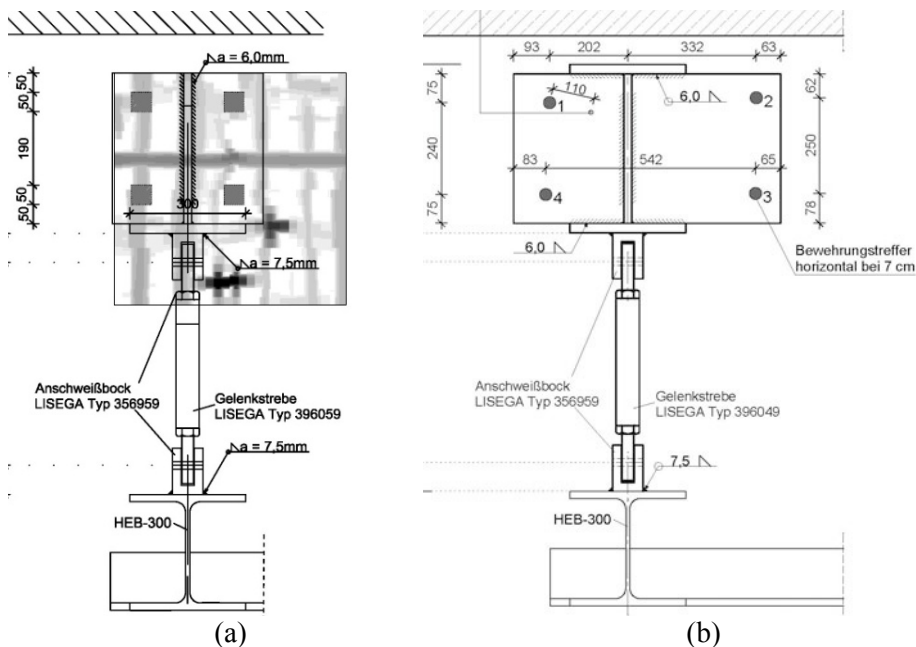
(a) Anchor plate as originally designed and the subsequent reinforcement scan (b) As-built drawing of redesigned anchor plate
